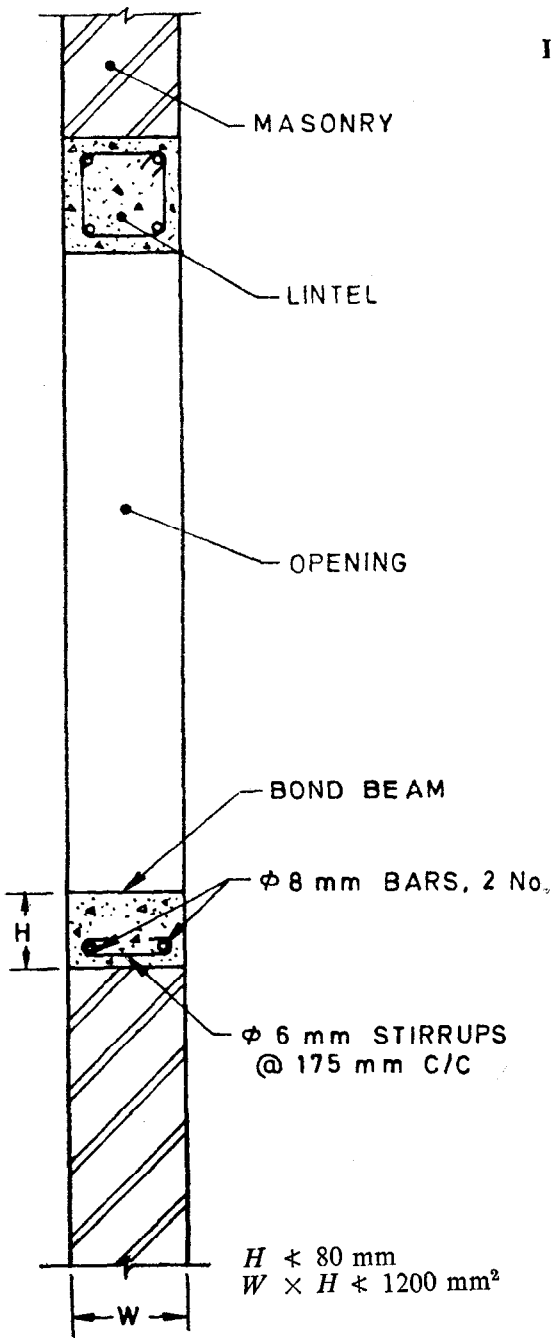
NOMINAL REINFORCED CONCRETE BOND BEAM AT SILL LEVEL
